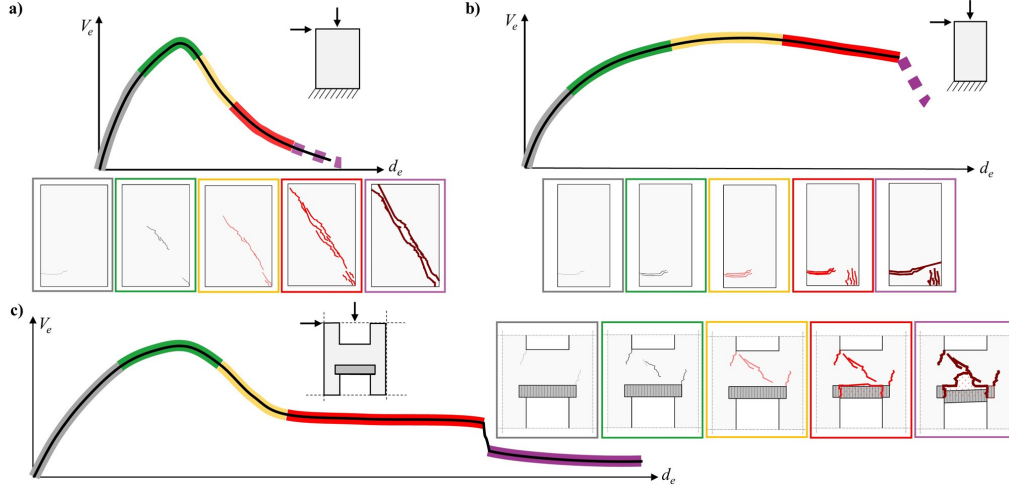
Interpretation of the observed damage at the wall scale for (a) squat pier elements under compressive-flexural action generating diagonal cracks, (b) slender pier elements under compressive-flexural action and (c) spandrel elements.
